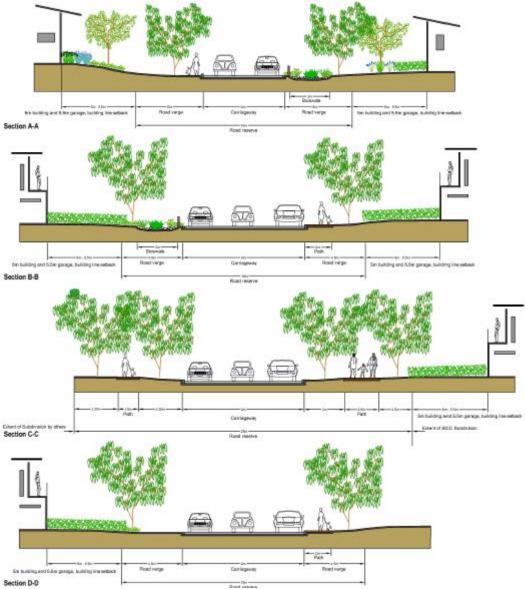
Typical road cross-section. Refer to Attachment 12
